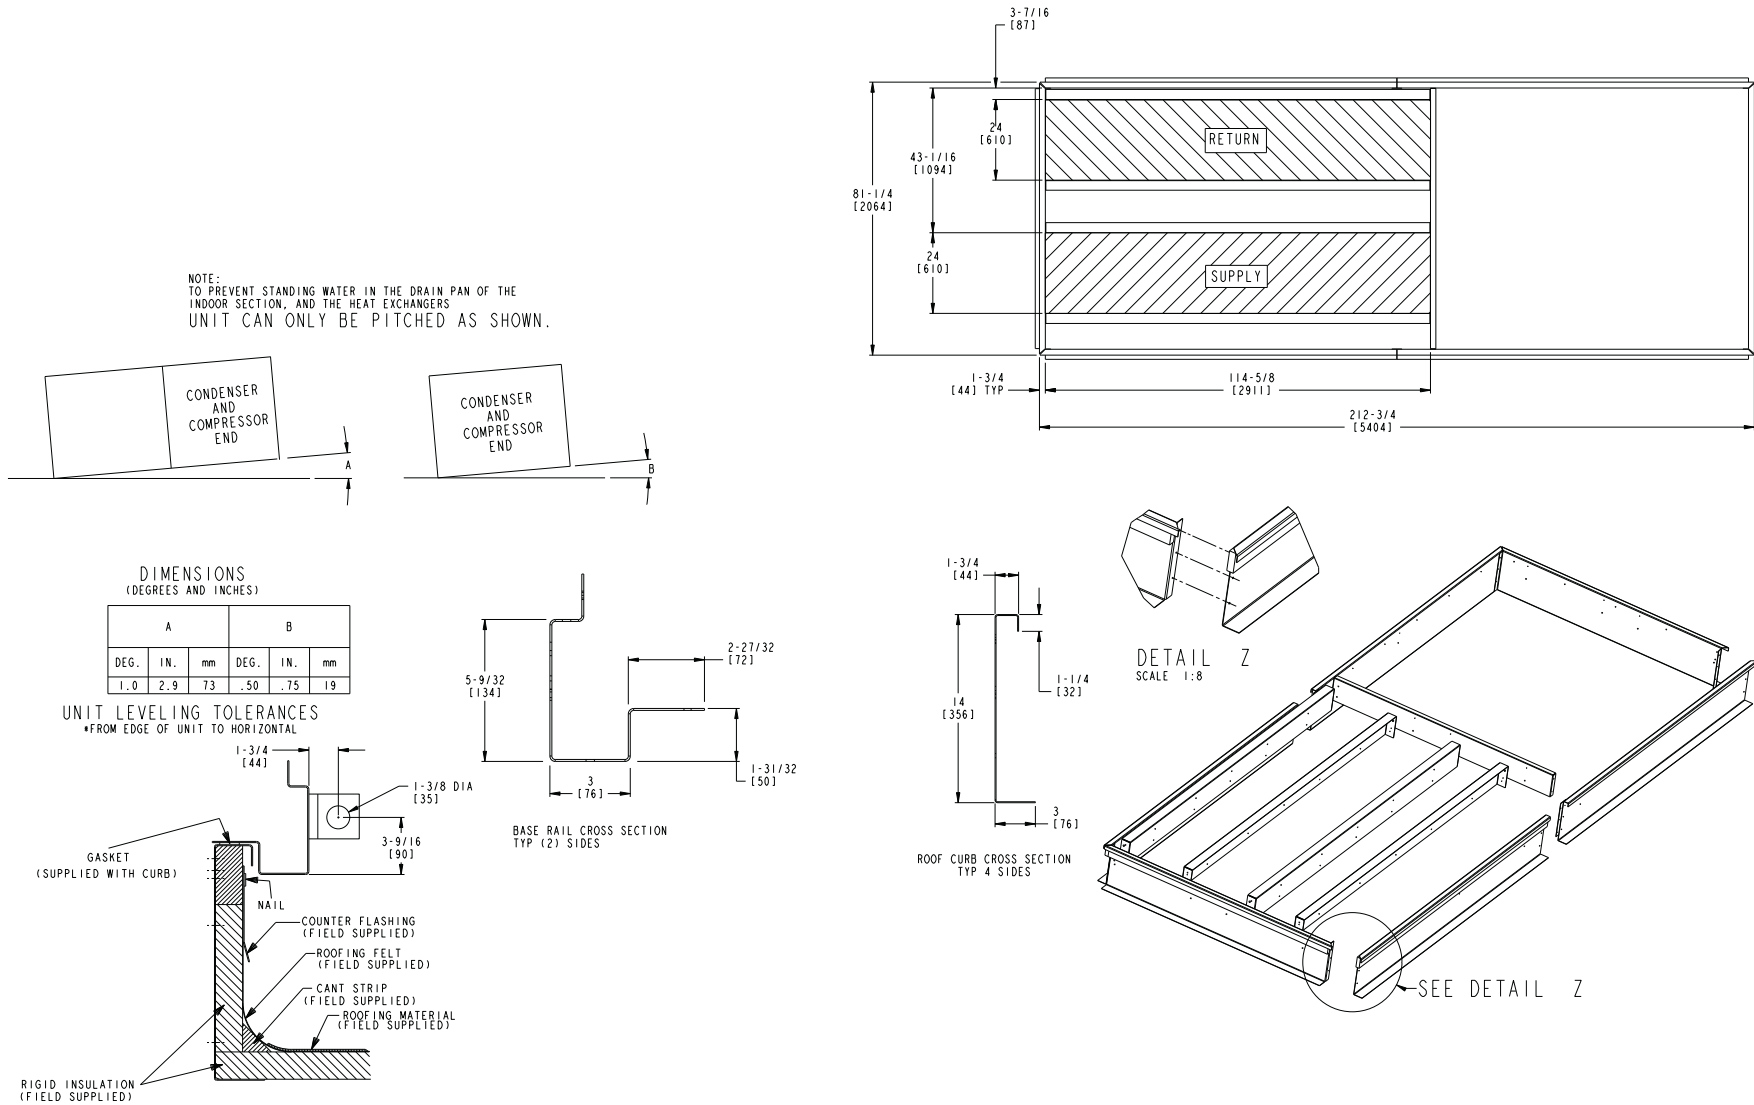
Roof Curb — 48A2,A3,A6,A7040-050 Units
